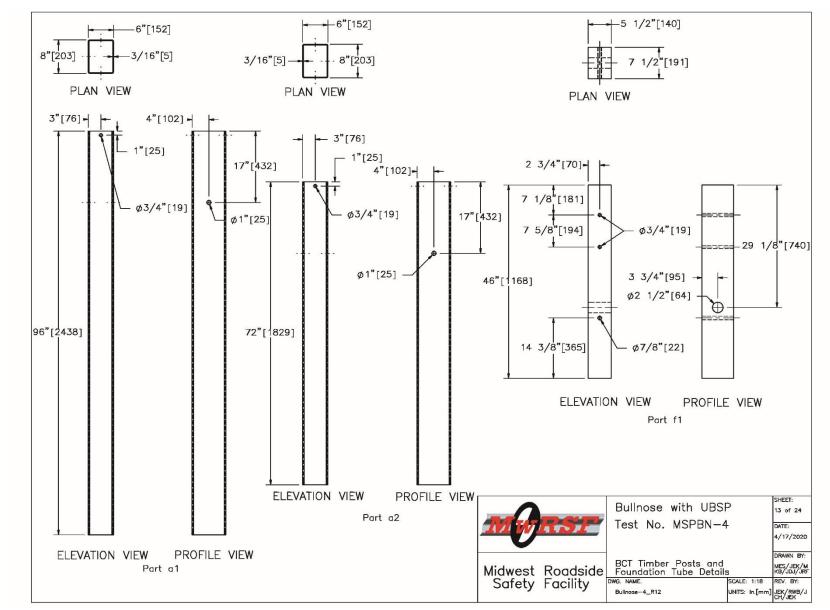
BCT Timber Posts and Foundation Tube Details, Test No. MSPBN-4
